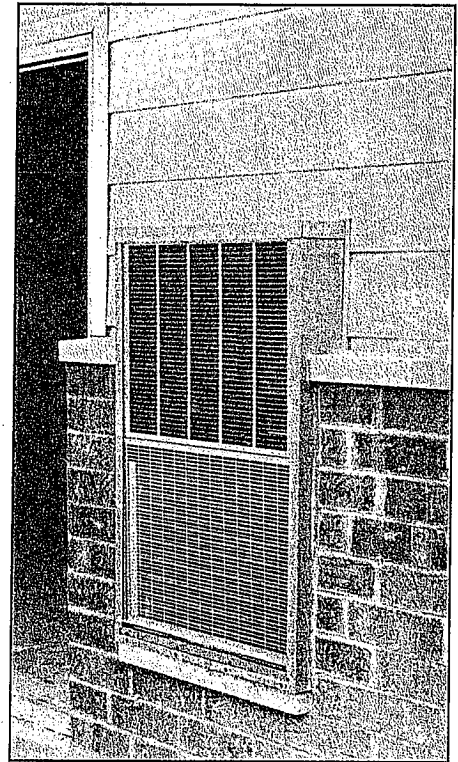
(top) and Figure 3 (right) - Wood frame construction with brick veneer tends to minimize vibration excitement of adjacent walls.
